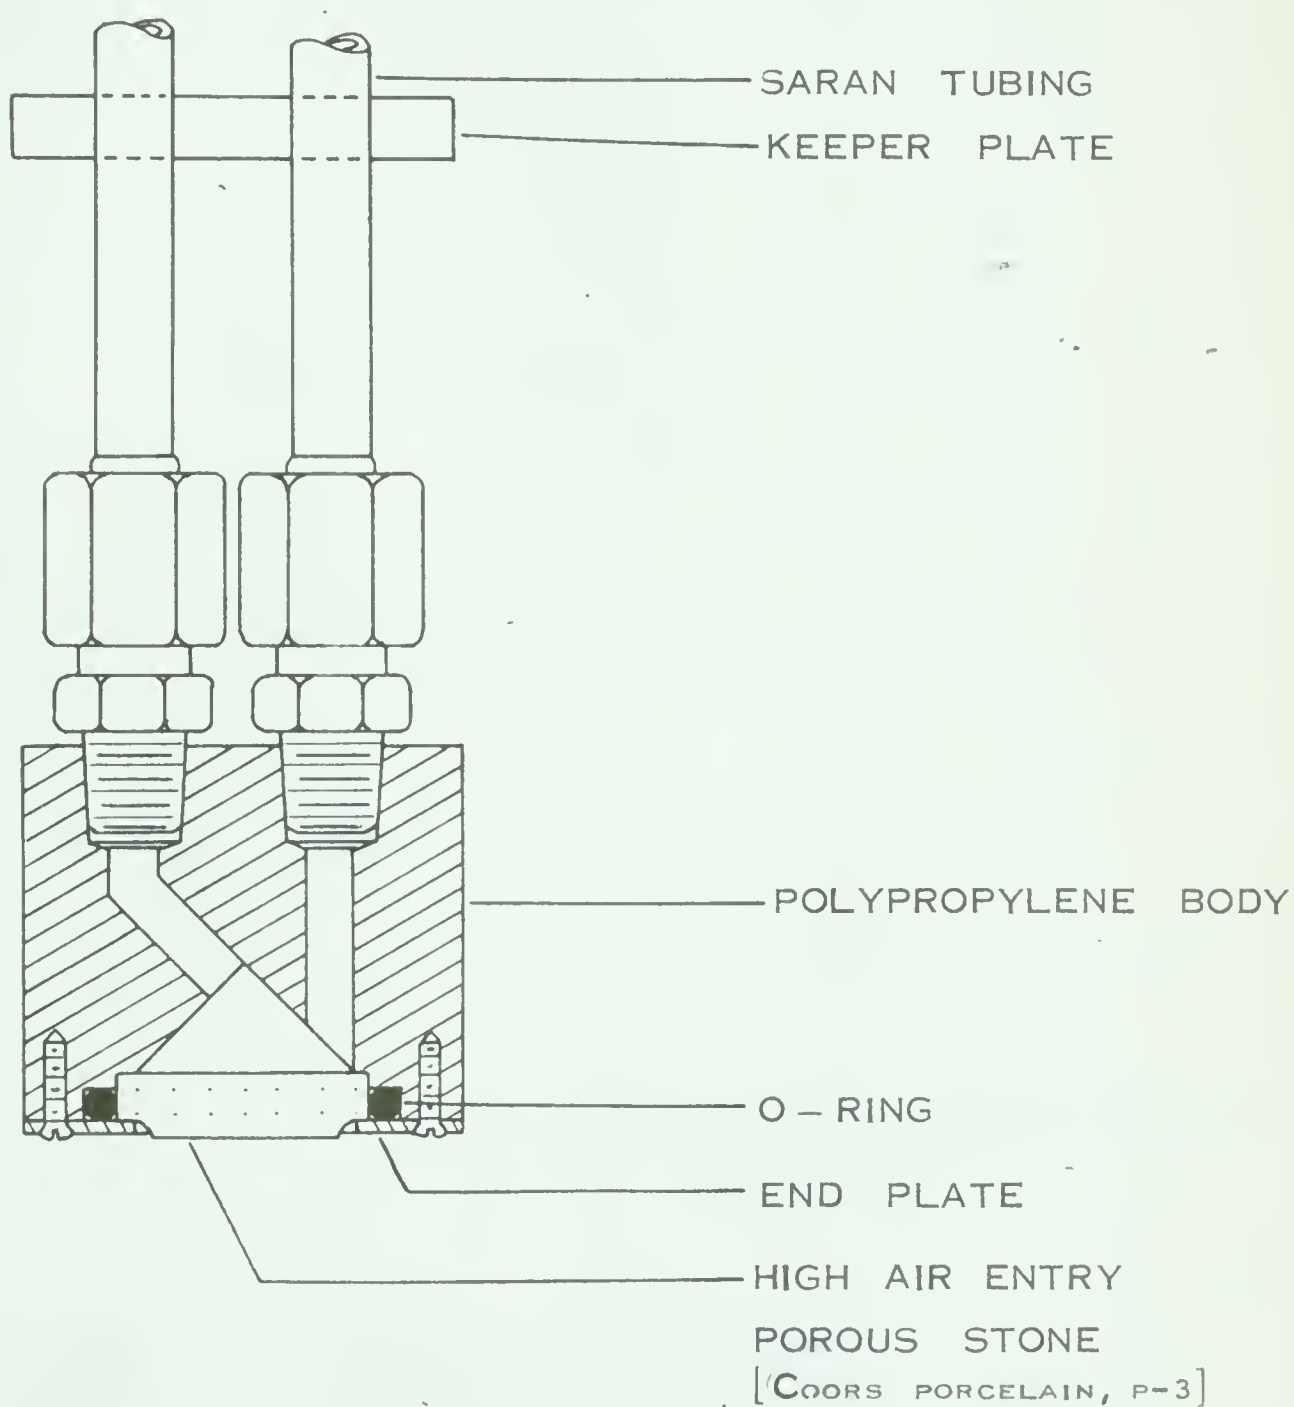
U.S.B.R. FOUNDATION - TYPE PIEZOMETER TIP
